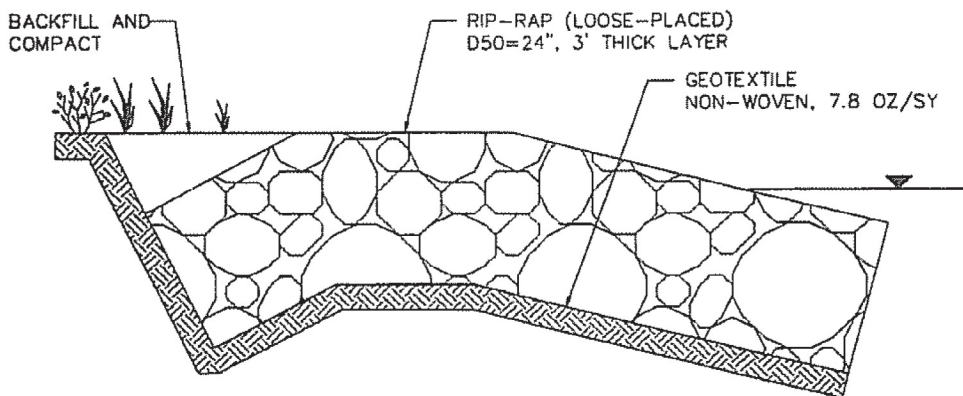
d Rip-Rap Cross-Section, Typical
